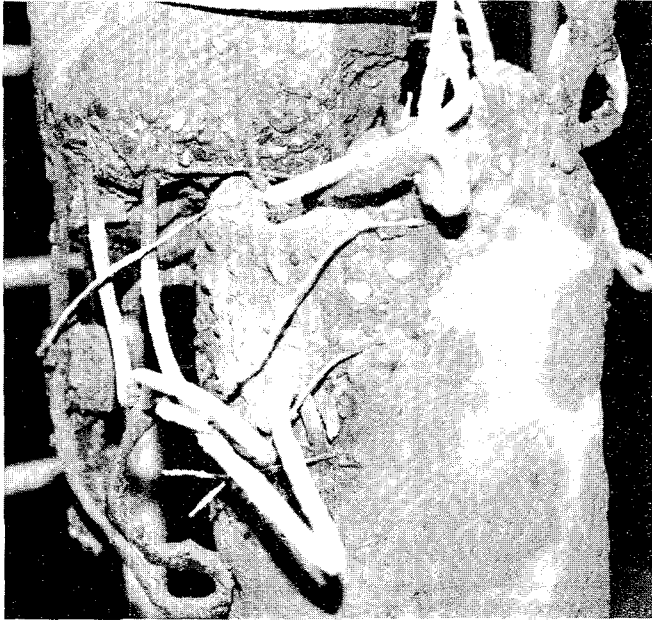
Damage of the upper portion of No. 2 Piles of A-building
